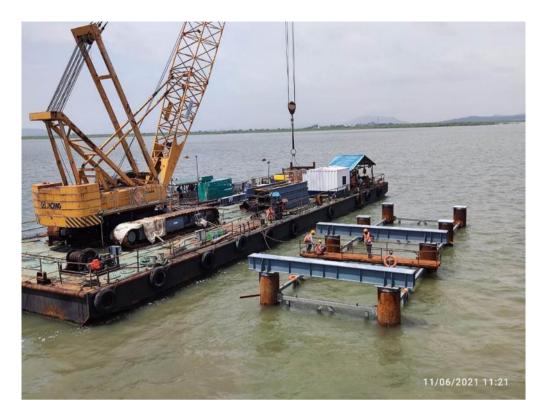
Crane platform erection works at Intertidal Zone in progress
